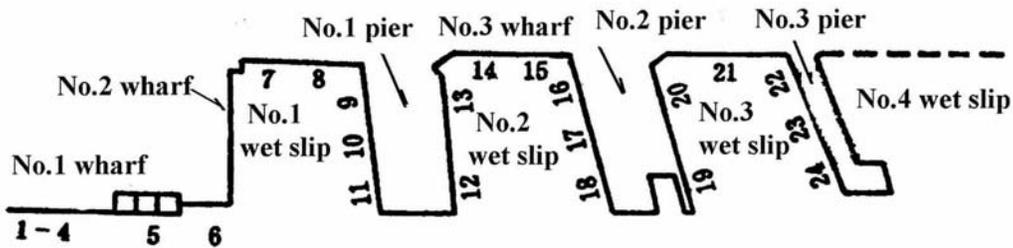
Arrangement plan of berths of the New Port of Tianjin.
